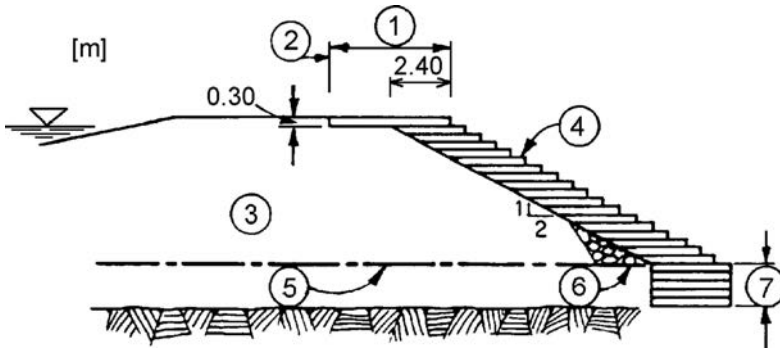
A typical section of an earthfill dam with a crest and downstream slope faced with roller-compacted concrete (after Powledge & Sveum, 1988). (1) Variable; (2) lining of the crest from the point with critical depth; (3) earthfill embankment; (4) roller-compacted concrete; (5) upper boundary of the earth material in the base; (6) drainage; (7) excavation and roller-compacted concrete in the river bed up to firm and sound rock.
